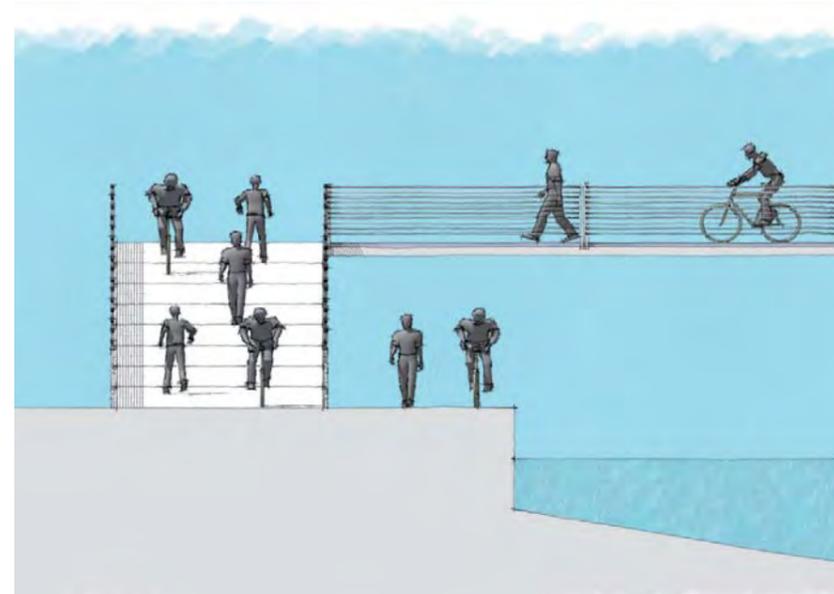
Approach ramps and stairs may be located at the back of the path and riverbank. This is likely to encroach upon private land on the south bank.
